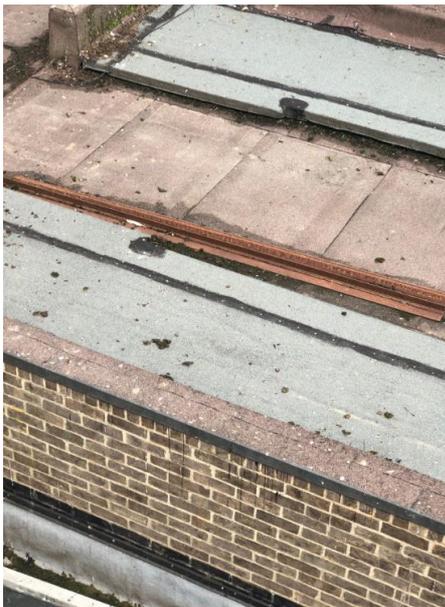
Flat roof area above dressing room area (access not available at time of survey)
